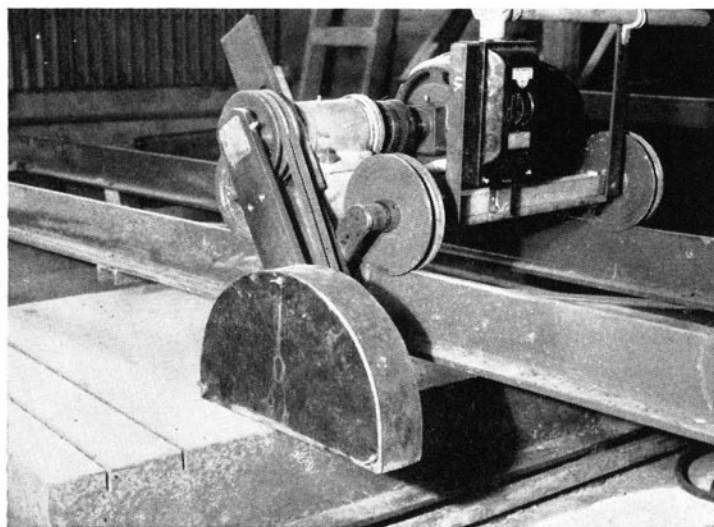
VIEW OF LABORATORY JOINT CUTTING MACHINE
